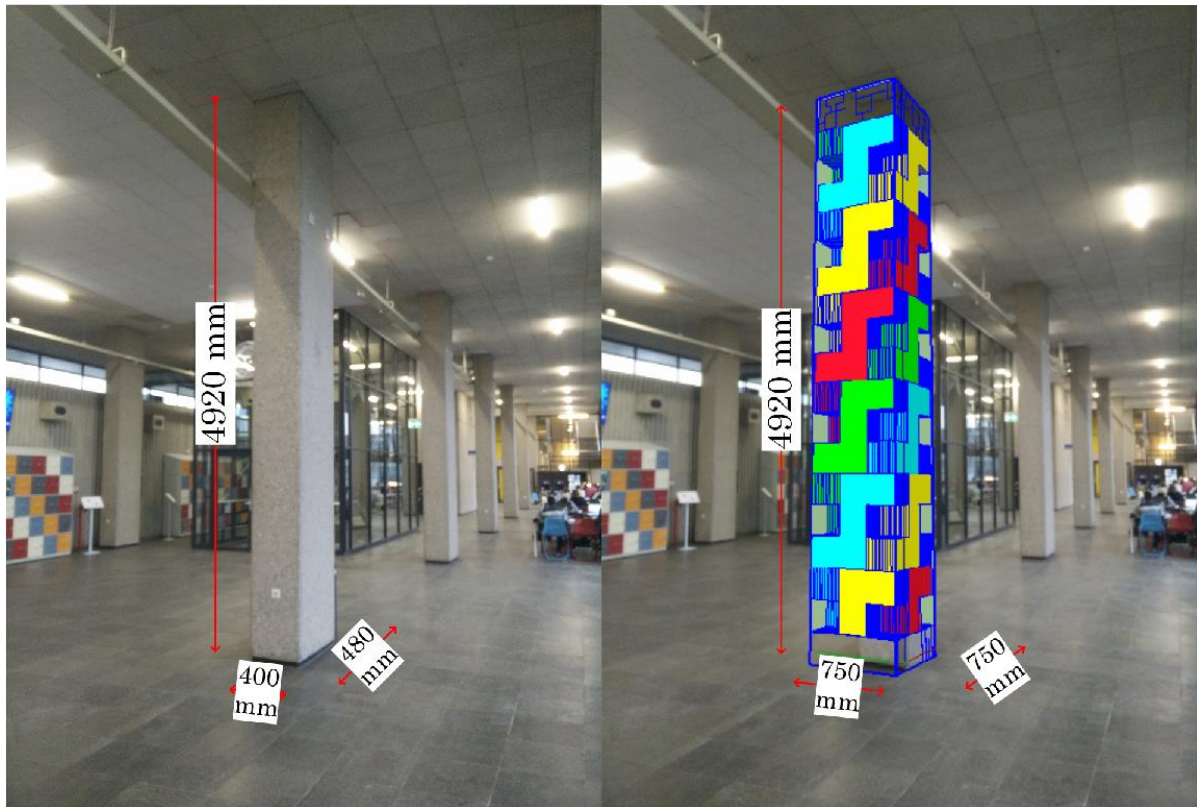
The existing concrete column (left) and the laminated Tetris column (right) with their dimensions).
